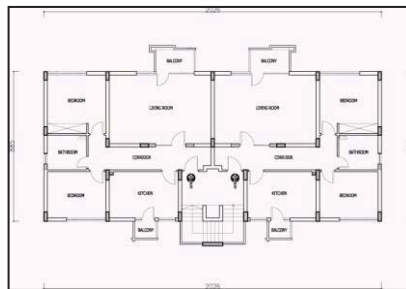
Floor plan layout of K1 (Source: İSDEMİR Archive, 2012 and revised by author)
